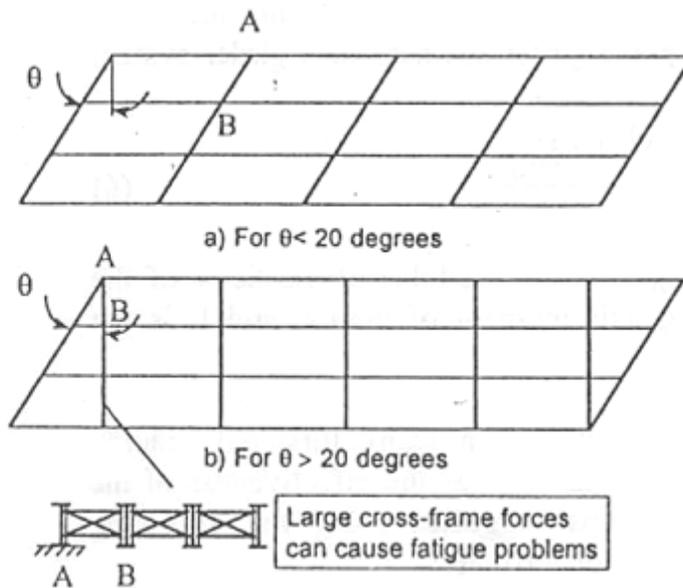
Braces on skew (top) and perpendicular to girders (bottom) [Wang& Helwig]
